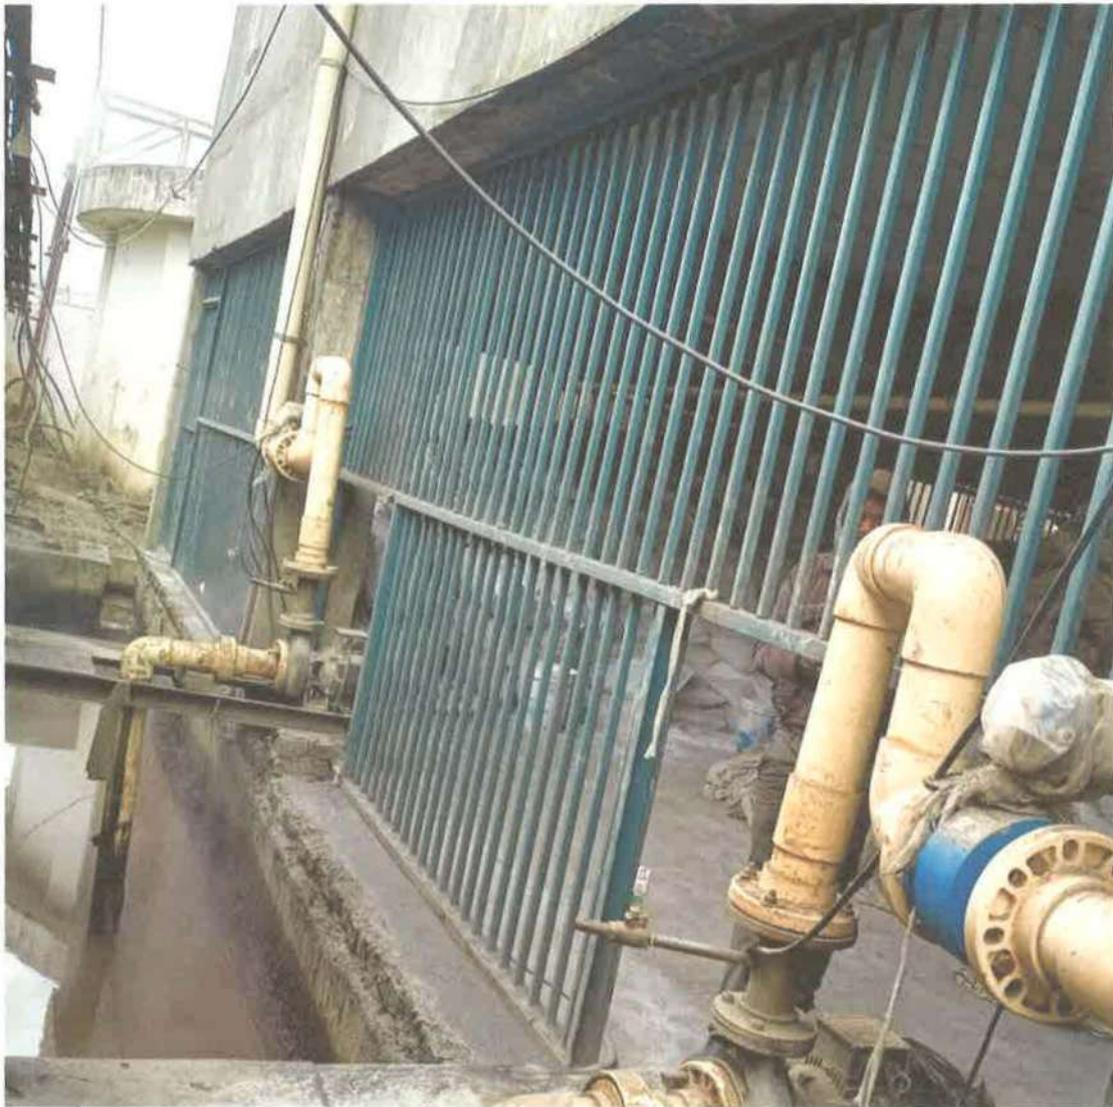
PHOTO : EFFLUENT COLLECTION TANK INSTALLED
